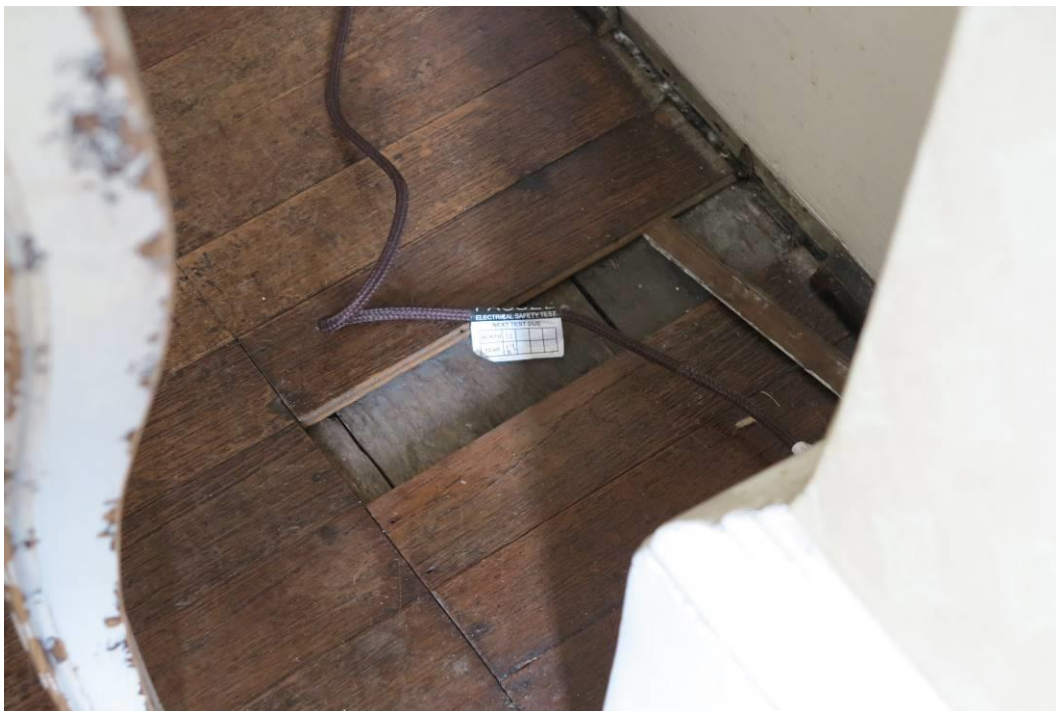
Modern floor finishes have been laid over the original boards on the ground floor
